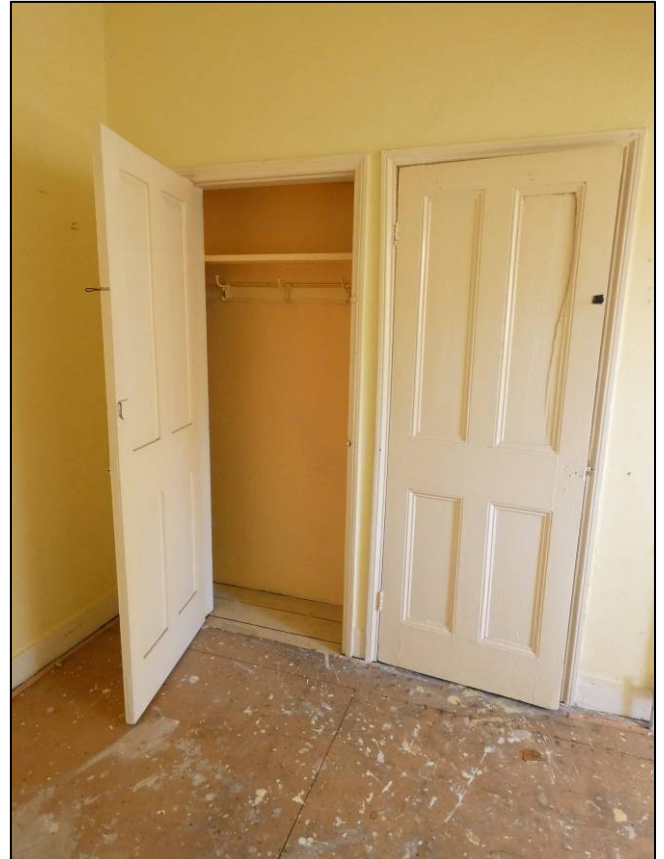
Room 3F4, wall cupboards to east wall, looking SE (photo 1/883).
